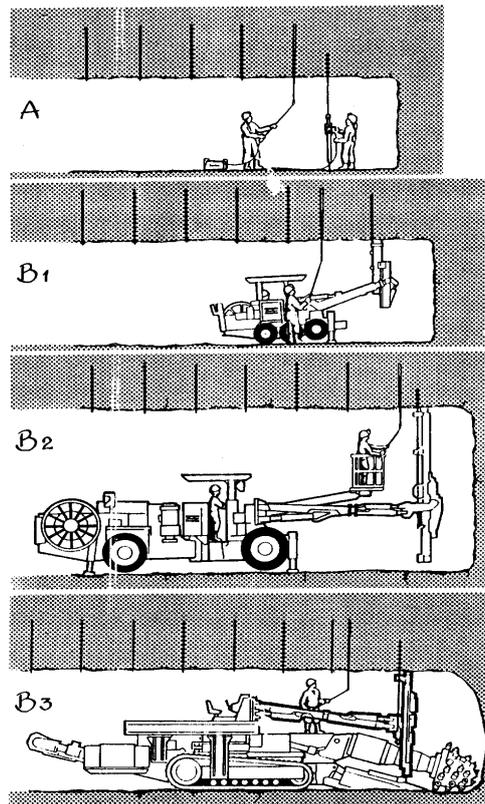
Anchors' implantation equipment in the massif rock: A- manual anchoring with light perforators installed on telescopic columns; B.1.- Semi-mechanised anchoring using reduced sizes perforating trolleys and manual installation of the anchored supports; B.2.- Semi-mechanised anchoring using large dimensions trolleys for manual installation of the supports; B.3.- Semi-mechanised anchoring using advance combination machineries foreseen with hydraulic perforators for manual installation of the anchors.
